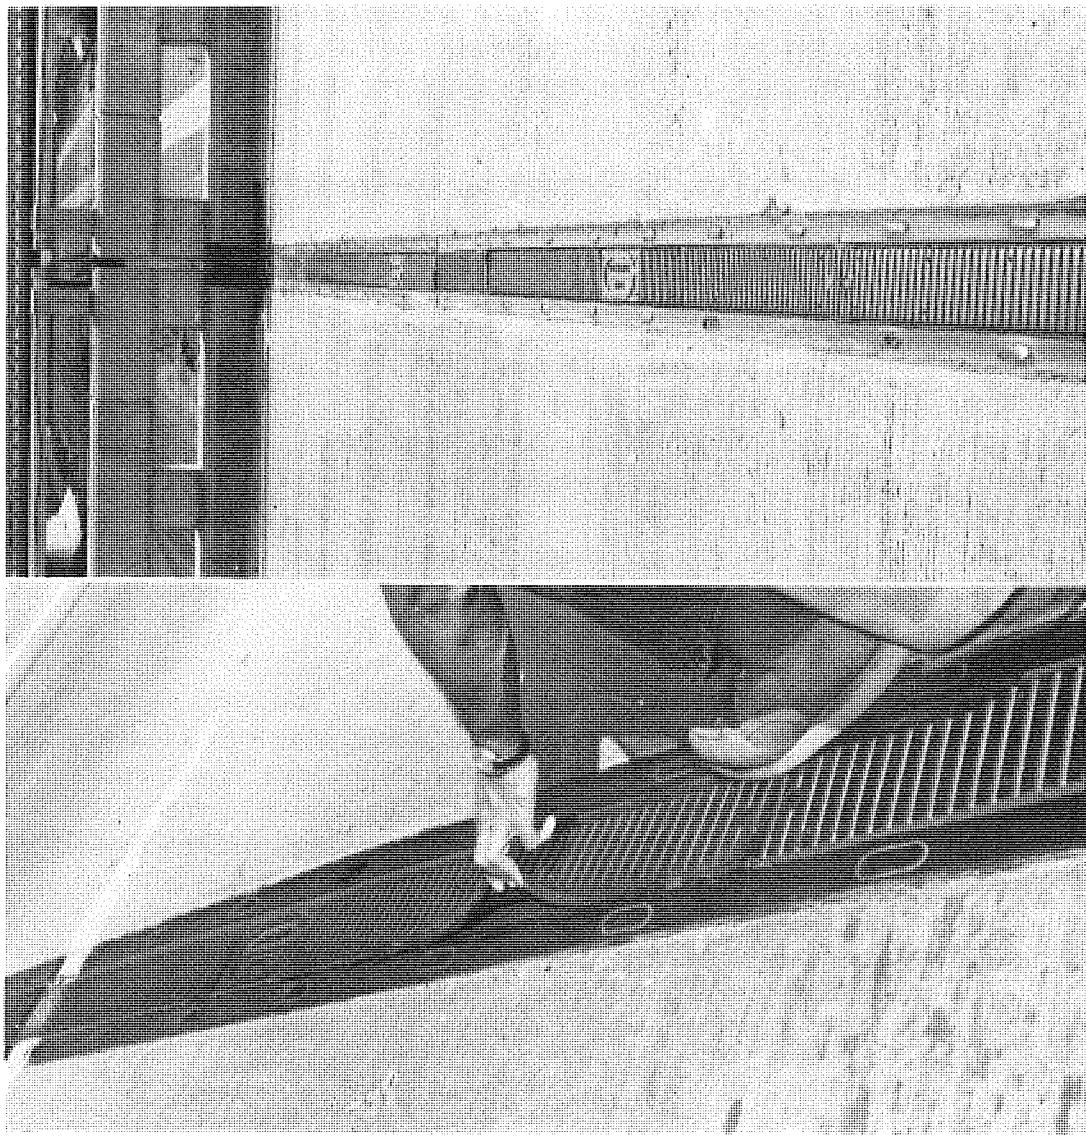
In some Detroit area bridges the polychloroprene has delaminated (left) from the steel reinforcing, and some pads (right) are found to be tilting in opposite directions, and also delaminating.
